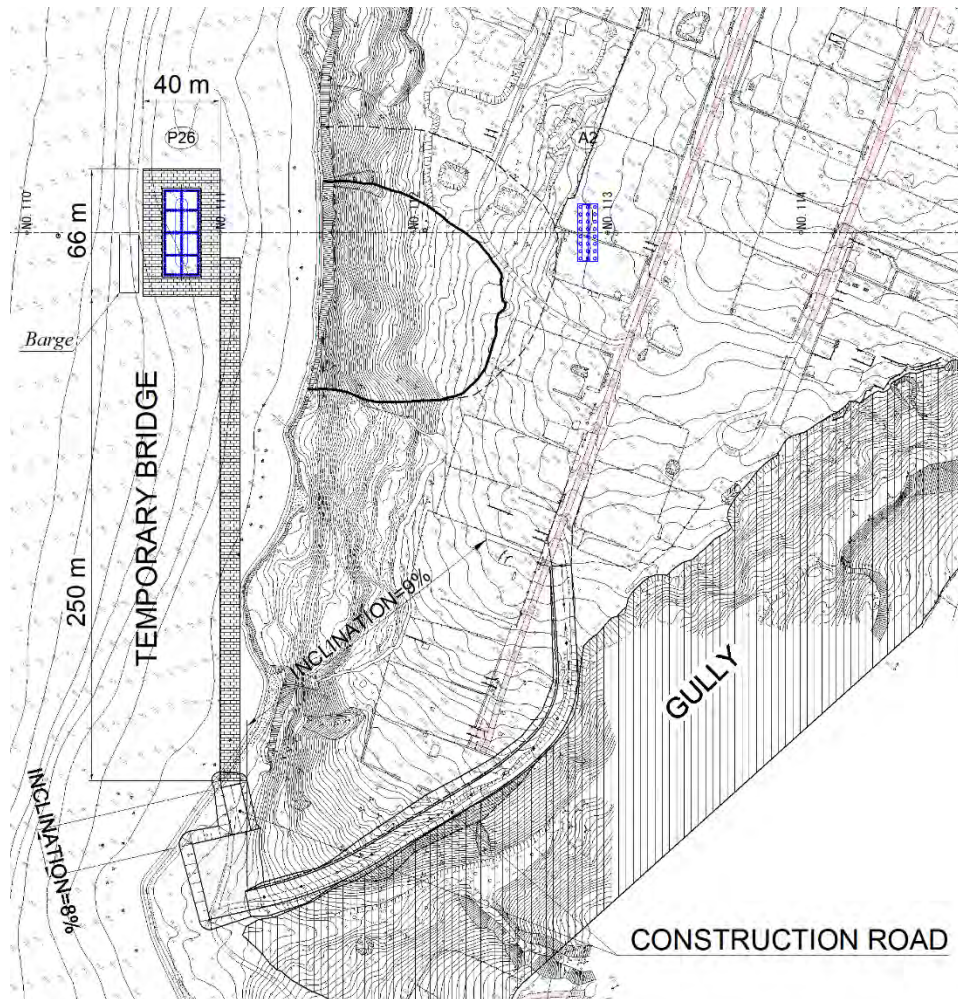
Right Bank Temporary Bridge and Construction Road
